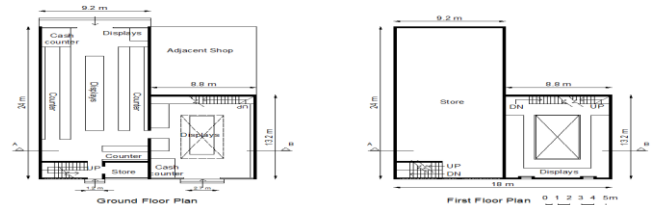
Floor plans of two amalgamated buildings of T-C02-02.
